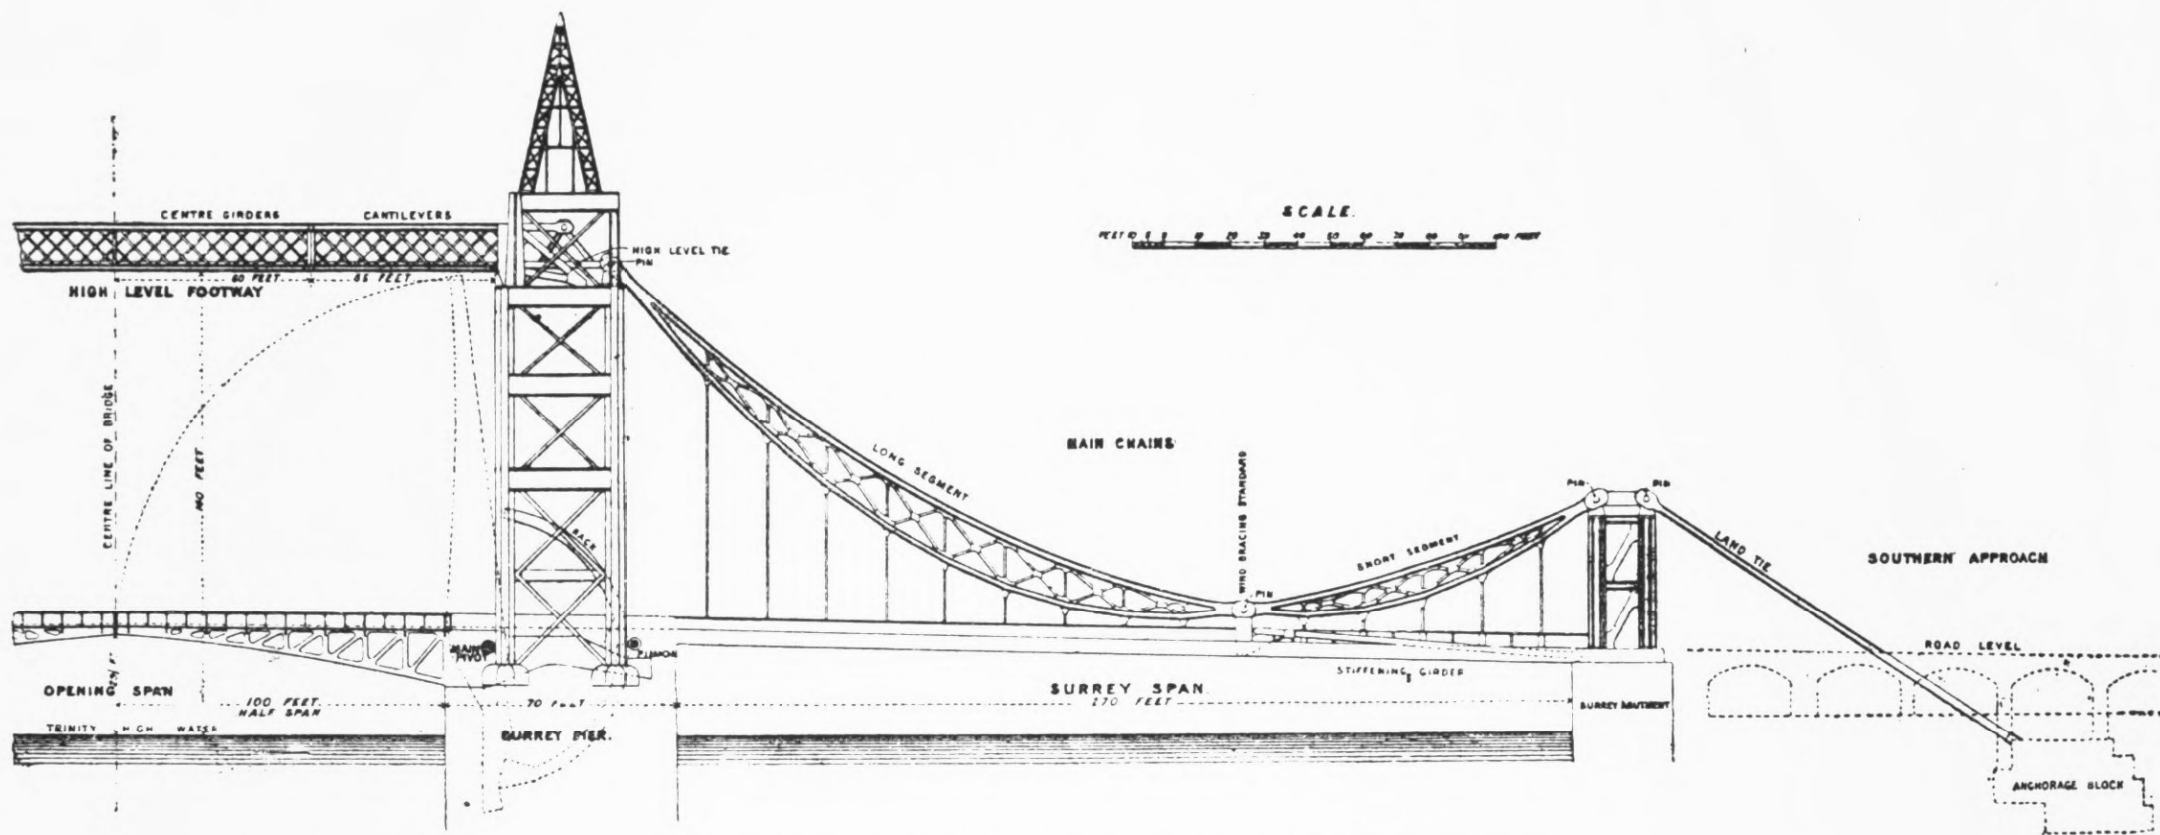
FIG. X. SKELETON HALF ELEVATION OF TOWER BRIDGE.
